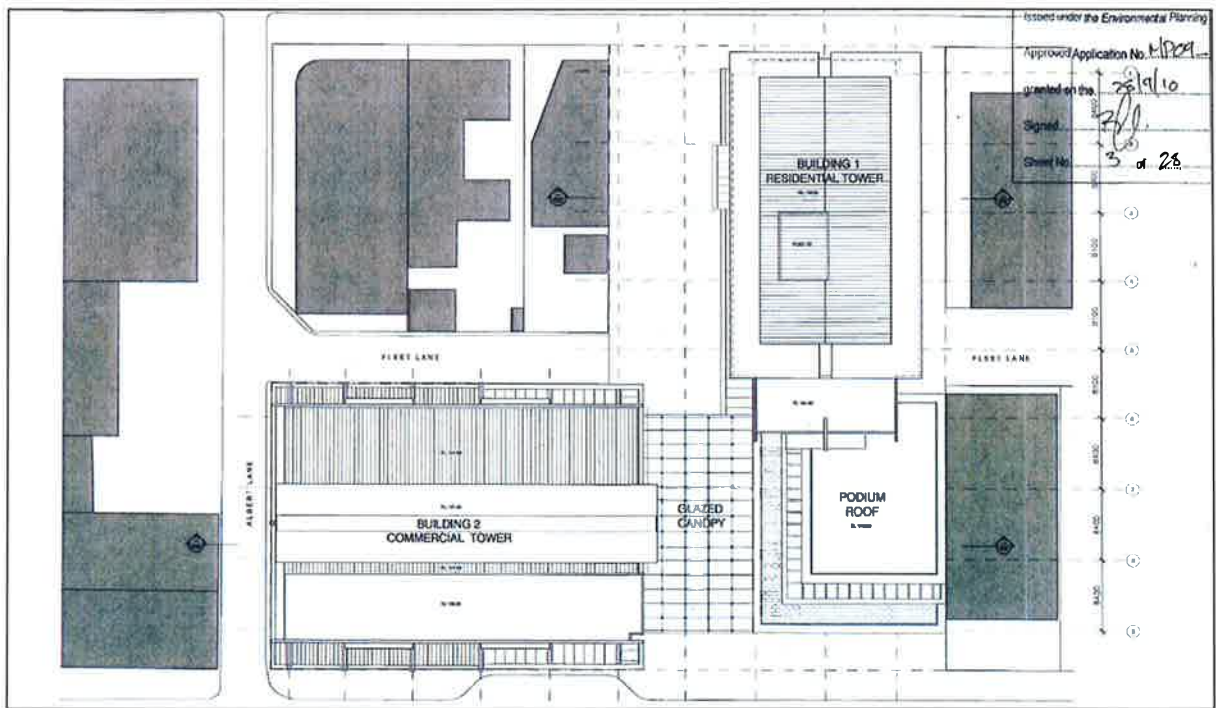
Approved Site Plan (Source: Proponent's PPR)
